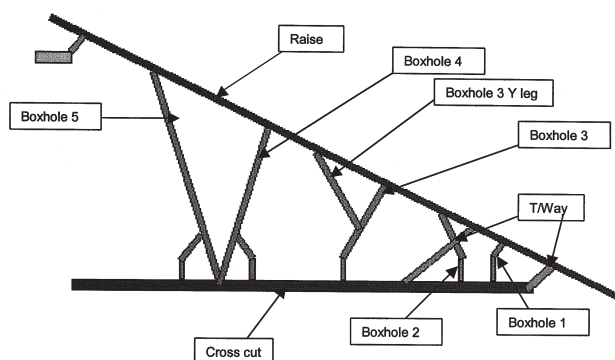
Cross-sectional raiseline layout with raise length of 267 m
